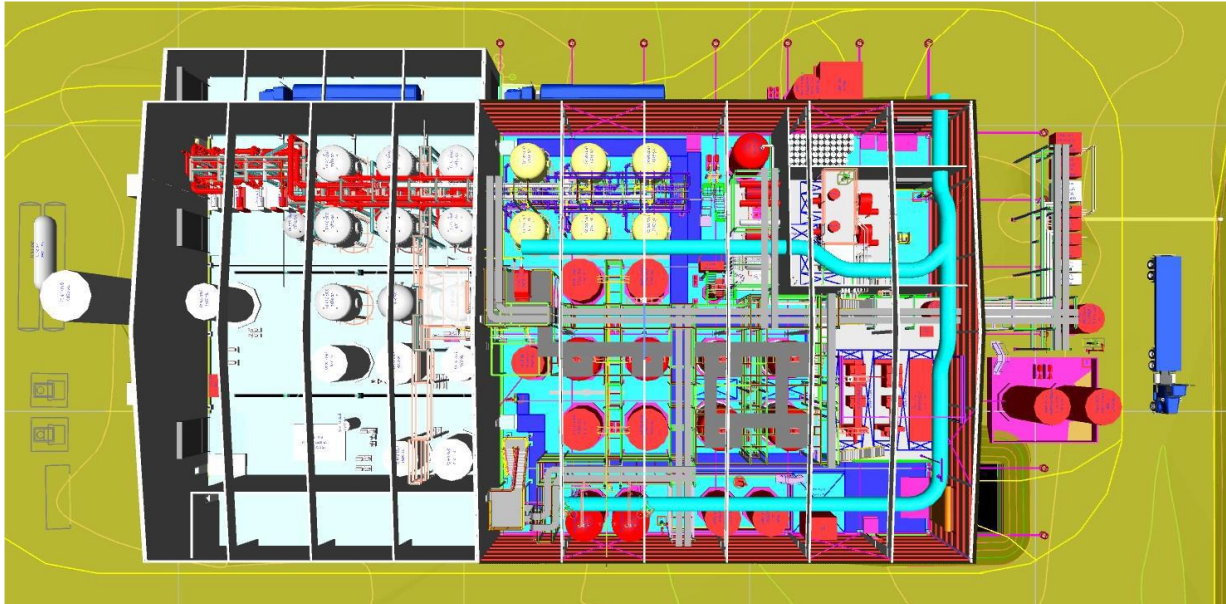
Design layout of the expanded Ross CPP at the Lance Projects (left hand 1/3 is existing facility; right hand 2/3 is plant expansion)
